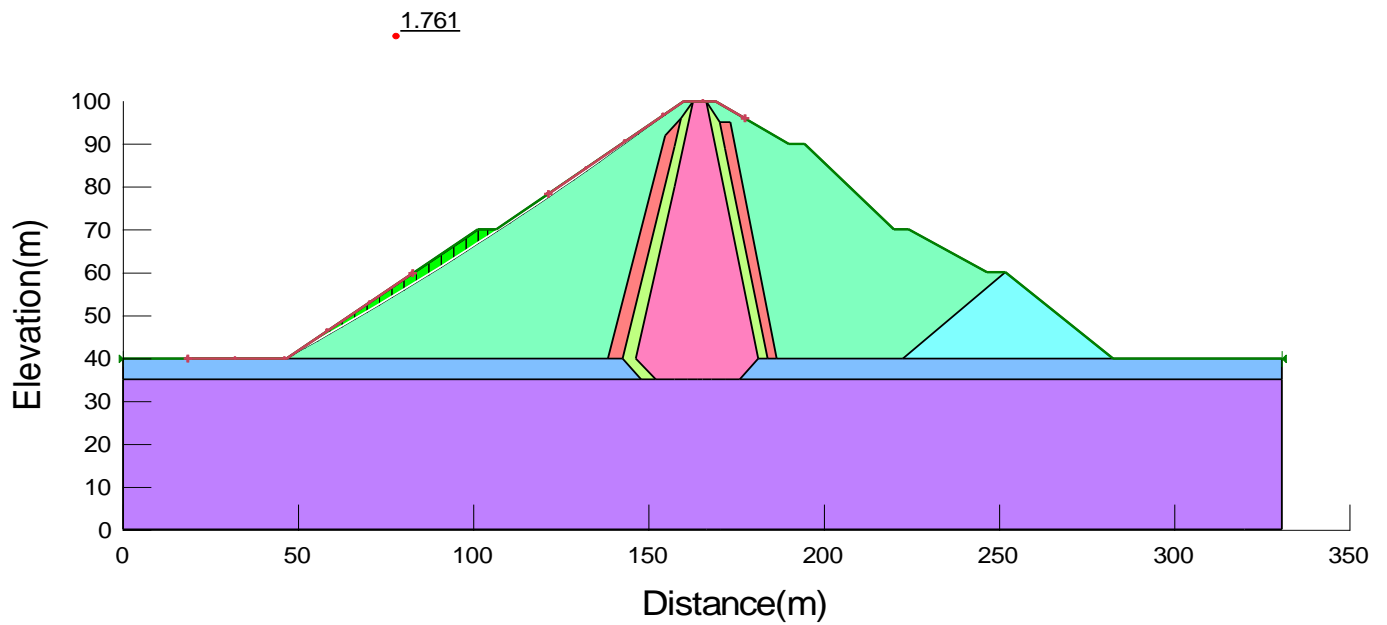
11: Slope Stability at end of construction without Earthquake CC (D/S)
